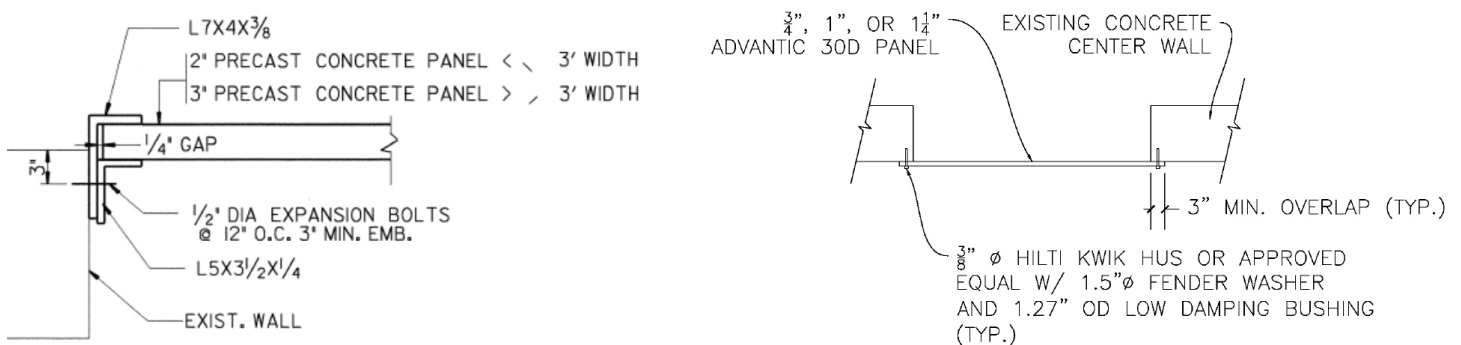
| (a) Original Precast Concrete Support Detail, (b) Revised Support Detail
